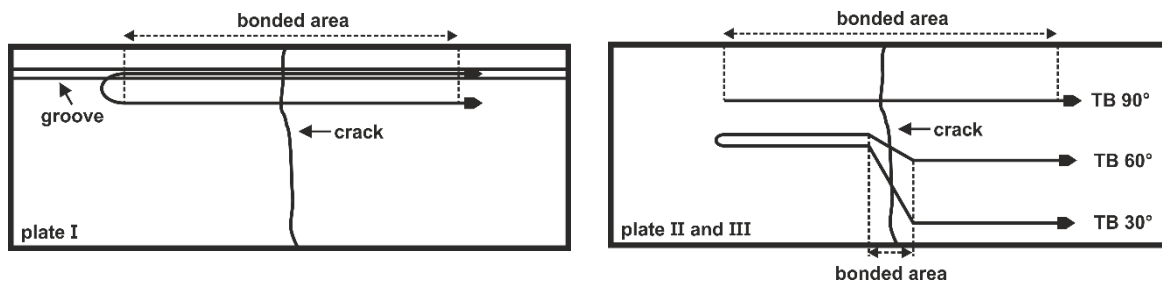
Application scheme of concrete plate I (left) and concrete plate II and III (right).
